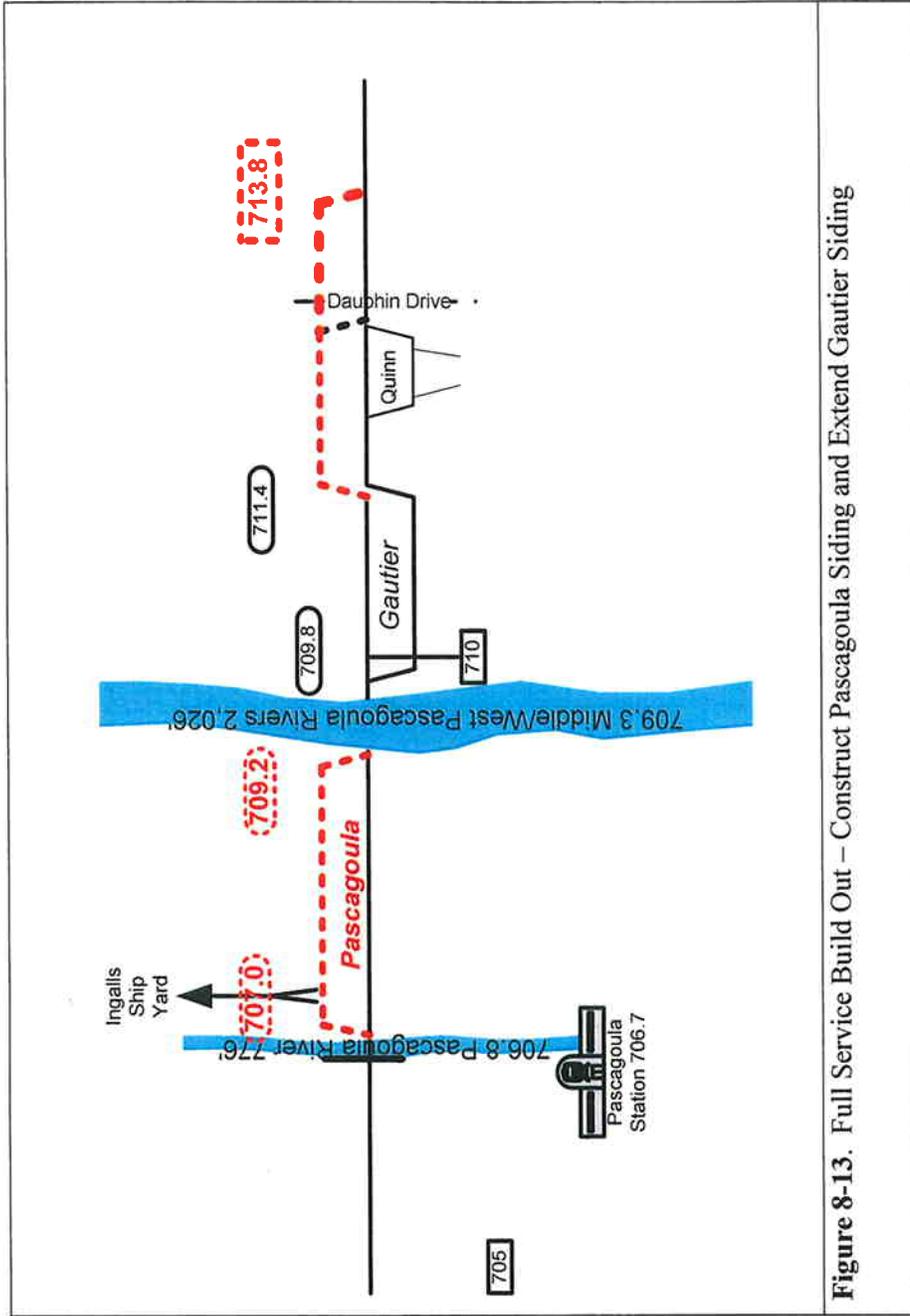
Full Service Build Out – Construct Pascagoula Siding and Extend Gautier Siding
